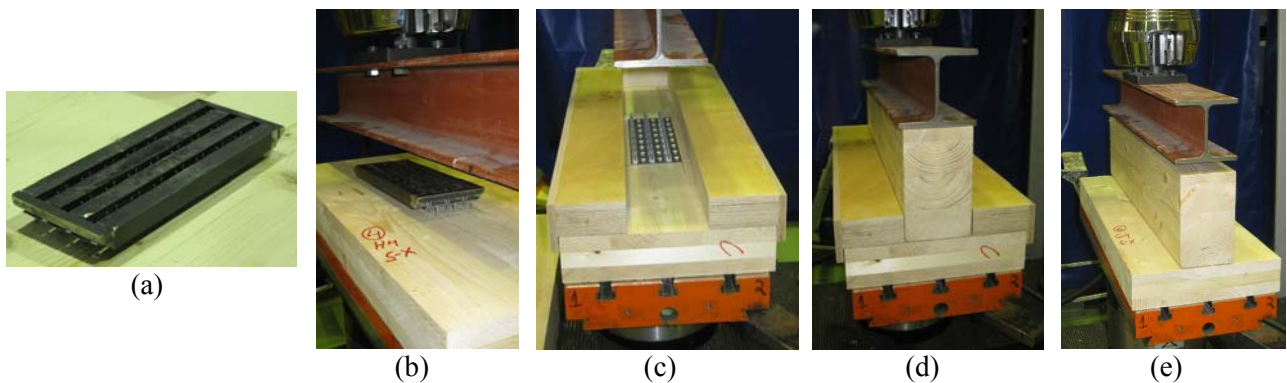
Fabrication process for the test specimens with double-sided punched metal plate
